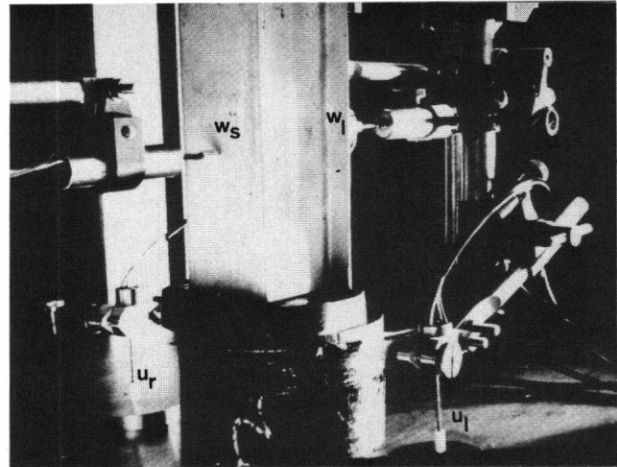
Local buckling, test specimen in the 800 kN compression machine
